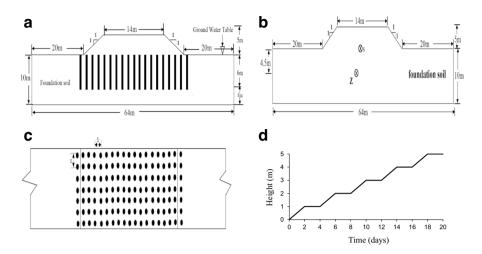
a Embankment constructed on consolidating soil with columns considered for the study. b The salient points considered for studying displacement and pore pressure. c Plan showing position of columns in foundation soil. d Construction sequence of embankment and method of loading
